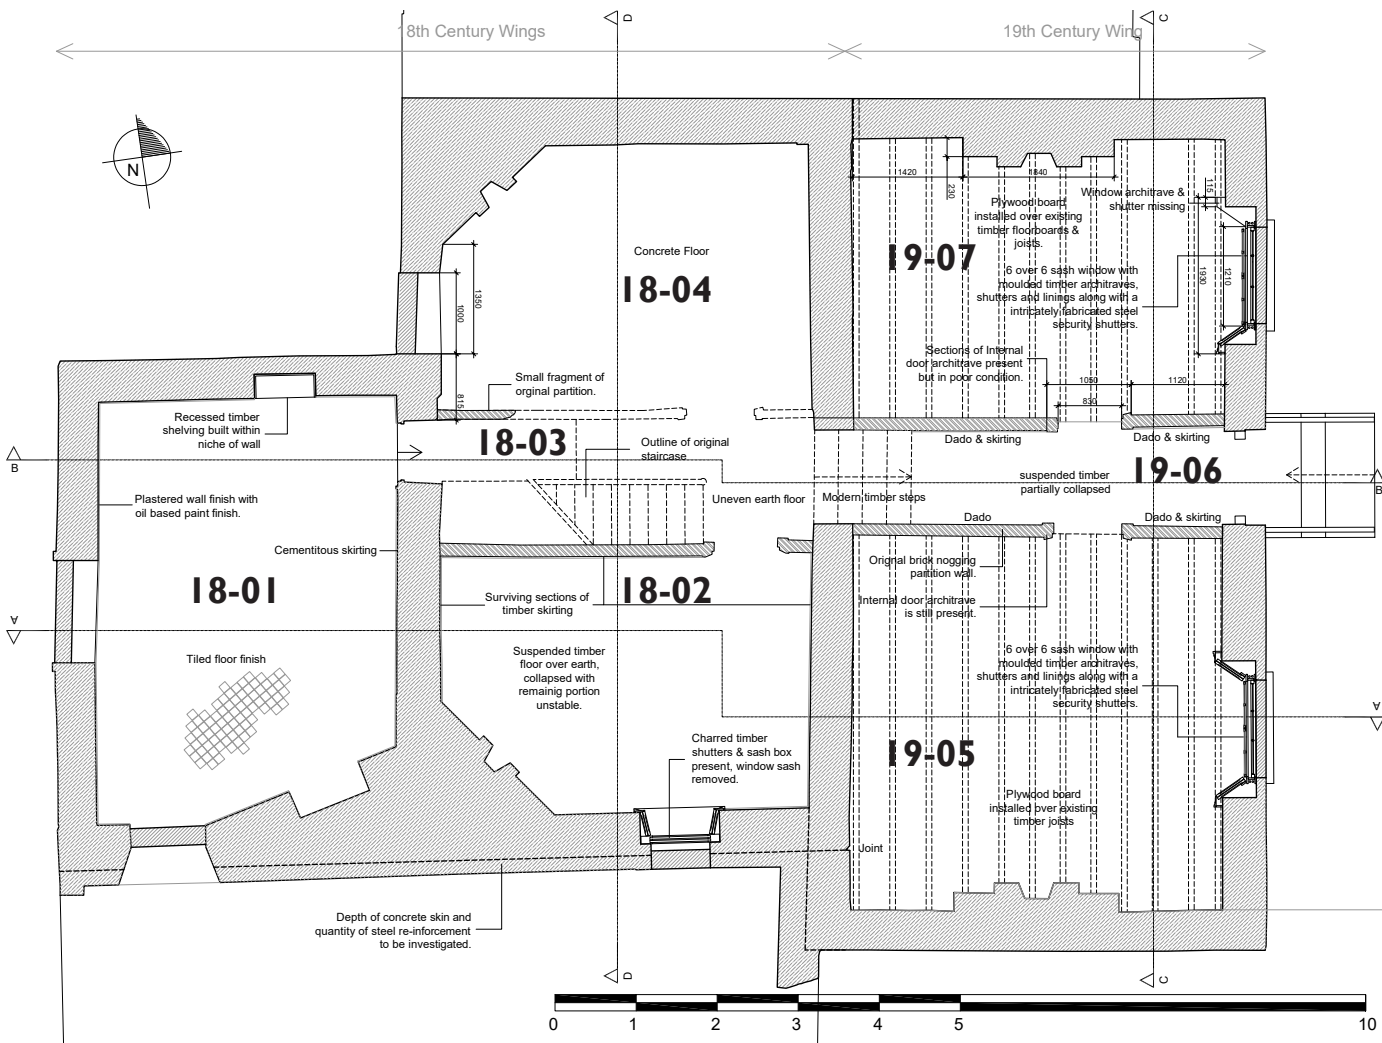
Lower Floor Plan- Blackwood Associates Architects Survey
